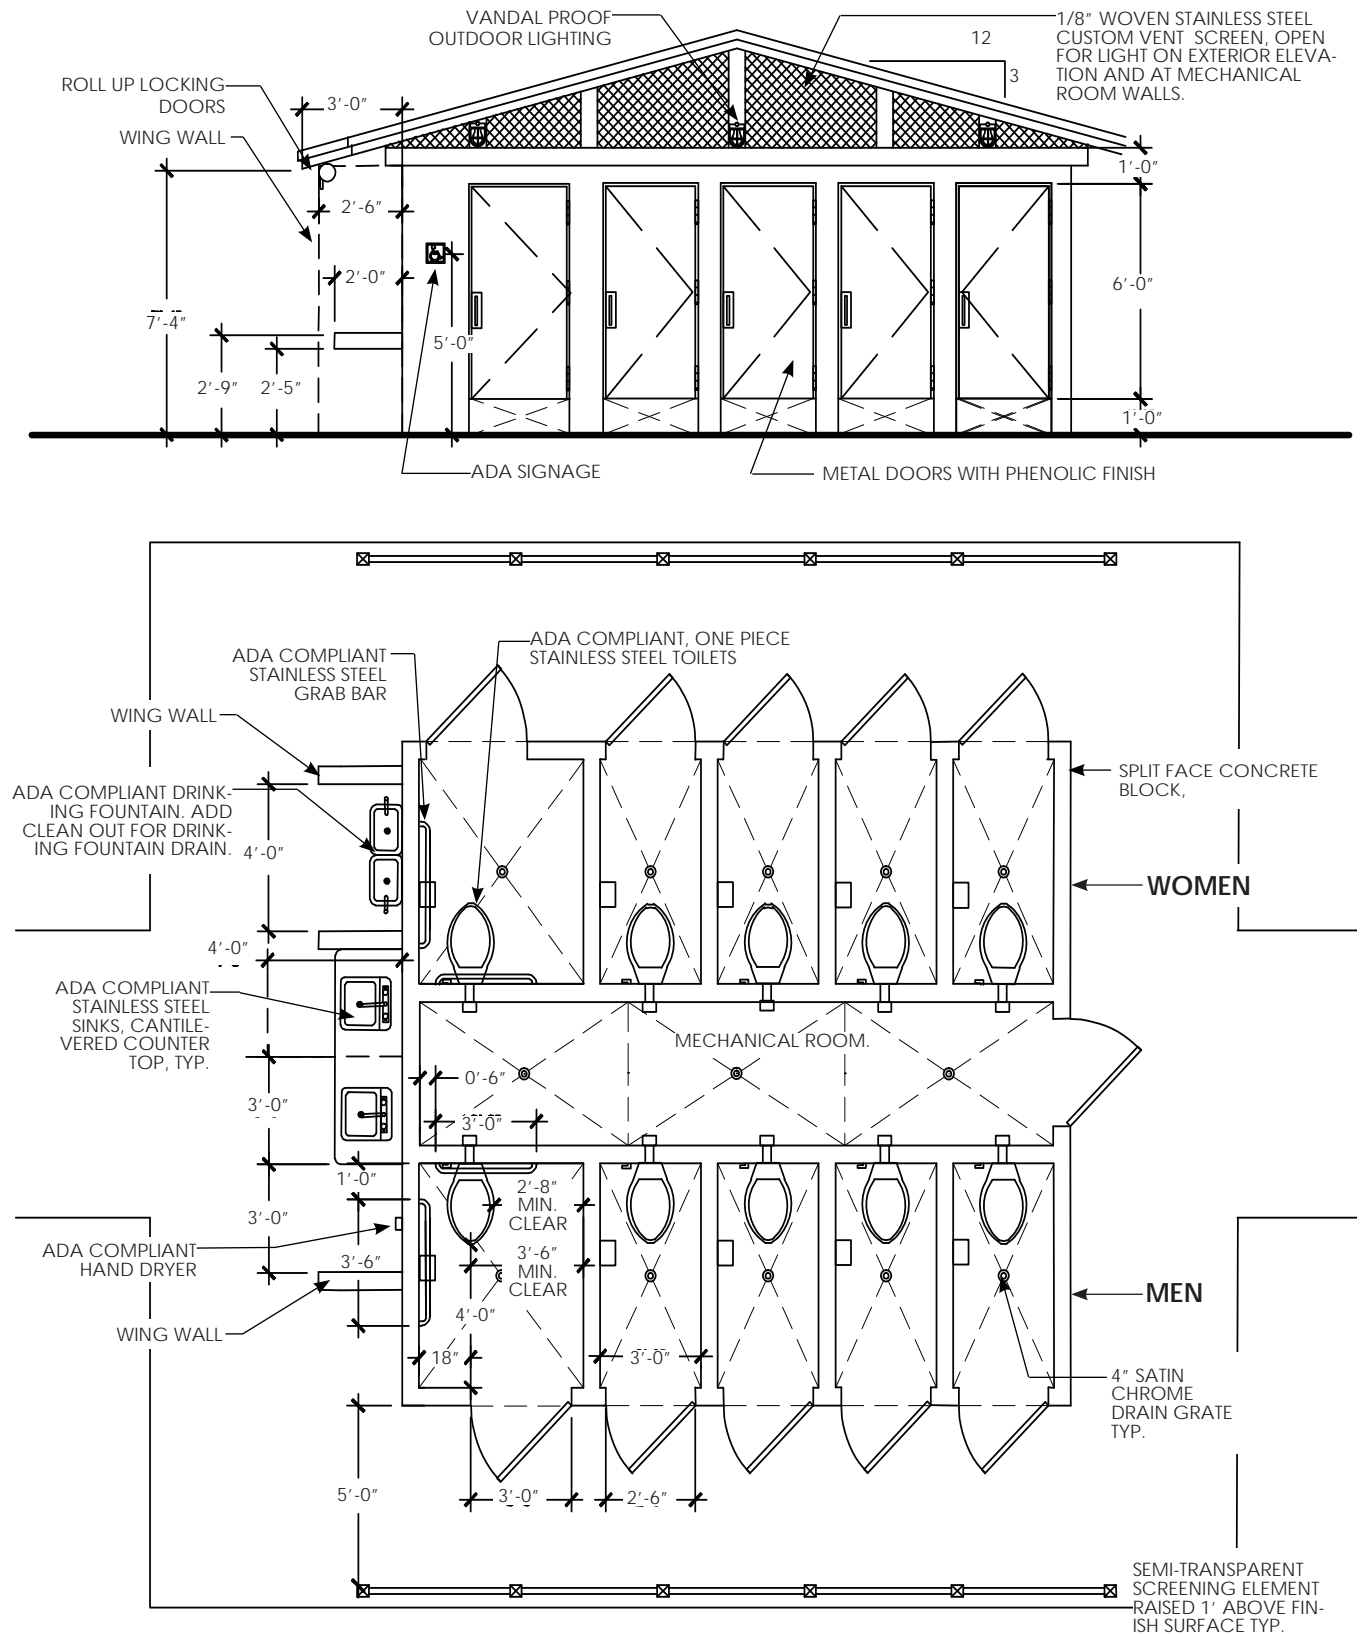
Preferred Restroom Building Layout Diagram (minimum 2 stalls)
